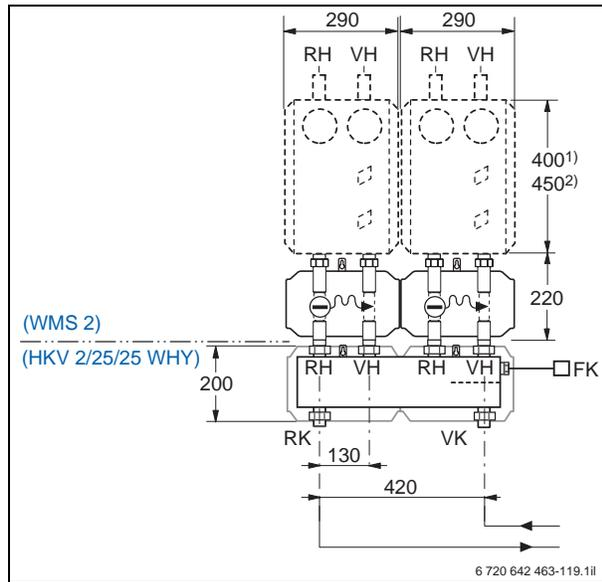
Dimensions of the heat meter set (dim. in mm)
